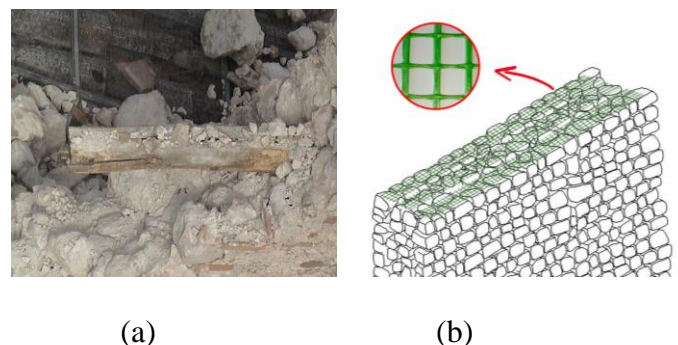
(a) Example of how a wooden beam is inserted inside masonry in an old building damaged by the L'Aquila earthquake in 2009; (b) Example of application of a GFRP grid.
